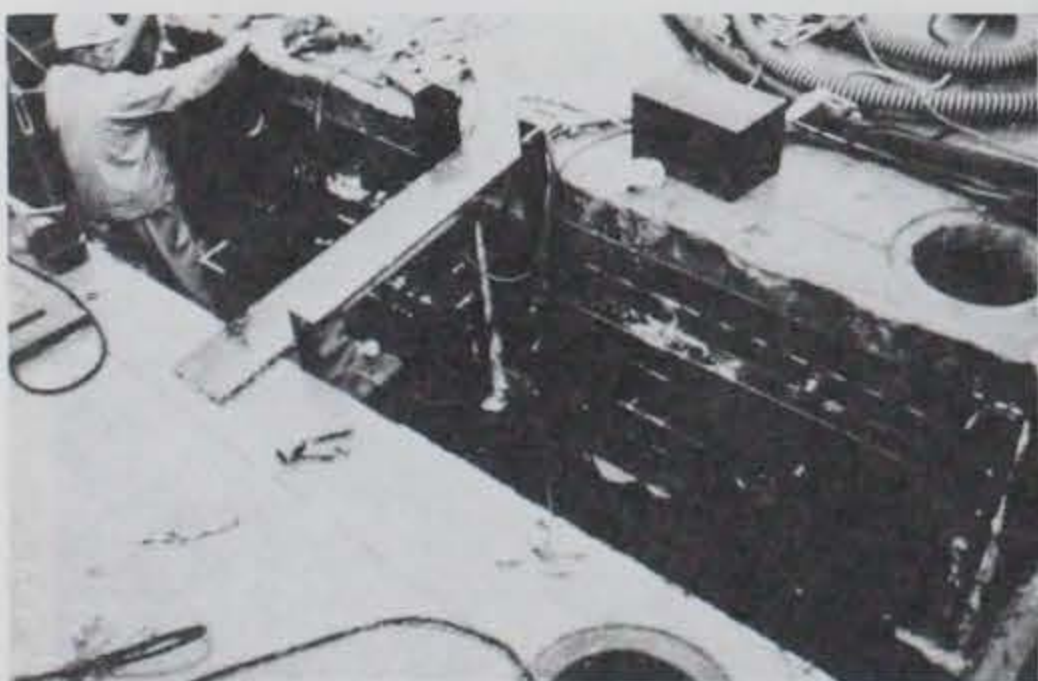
Anchoring plates being bolted in place (water activated sealant oozes from bolt holes).
